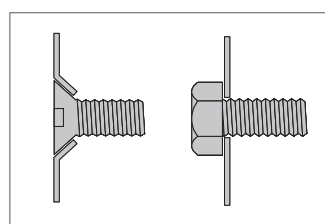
Options for making holes in the eaves beam (counterformed/straight)
